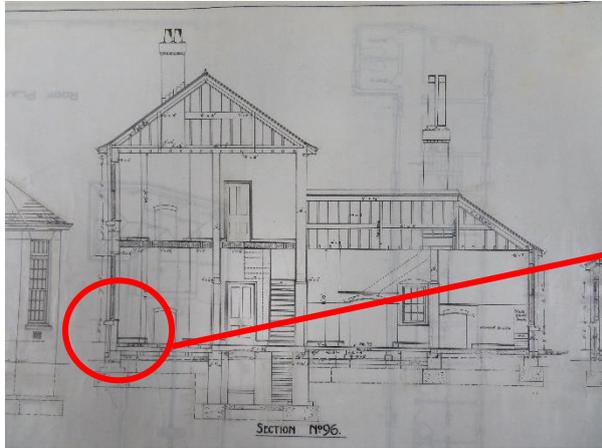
& 8, Drawings showing the use of cavity construction & Skinner, 1902)
